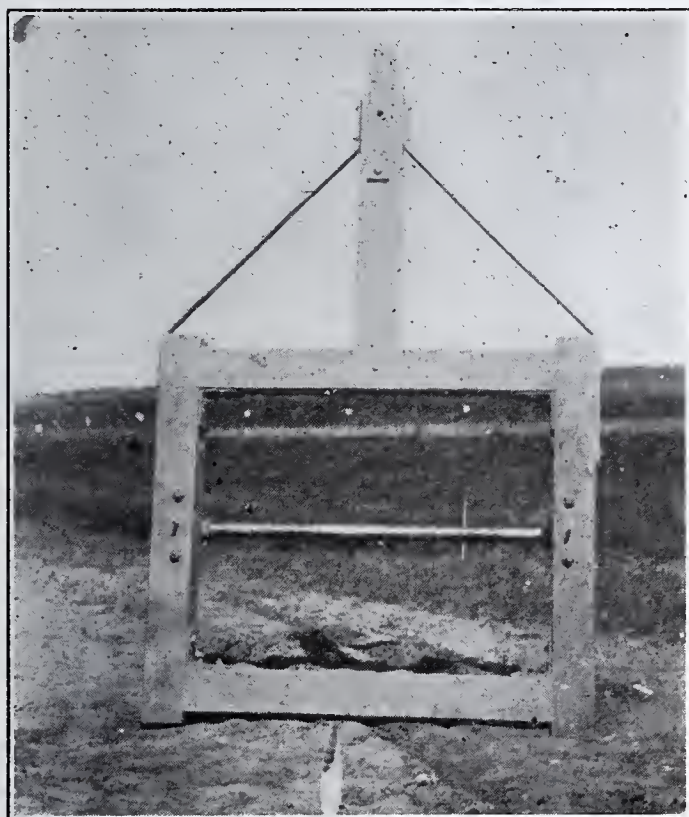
Details of frame for roller shown in Fig. 2. Timber, pine $5\frac{1}{4}$ " x $5\frac{1}{4}$ " held together on the inside corners by 5" angle irons, each flange of the angle fastened to the timber by two bolts. Regular commercial shaft bearings attached to under side of each end frame by two bolts. Shaft $1\frac{7}{8}$ " x 4'-6" held in place on inside of each bearing by 1" collar with set screw. Length of tongue exclusive of tenon through front frame 2'-11". Tongue braces a steel bar $\frac{1}{2}$ " x 2" attached to end of tongue by two bolts, and to corner of frame by one bolt and one wood screw. Steel plates $\frac{1}{2}$ " x 3" x 18" extending 6" beyond end are bolted over and under tongue. A clevis hole $1\frac{1}{4}$ " diameter centered $2\frac{1}{2}$ " from outer end of each plate. All bolts and wood screws are $\frac{1}{2}$ " in diameter, in wood the bolts have square shanks and round heads; in iron, the head is replaced by a thread and a nut.
